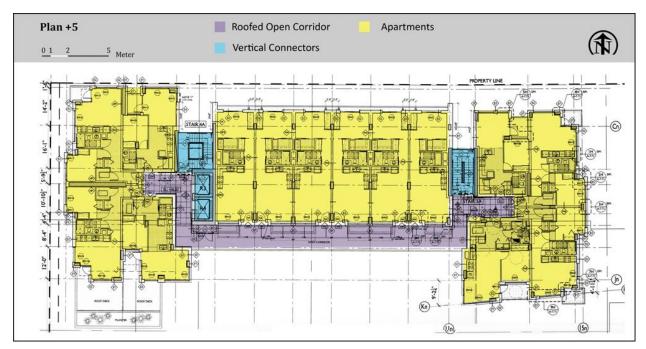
5th Floor Plan The arrangement of the open corridor and other areas
